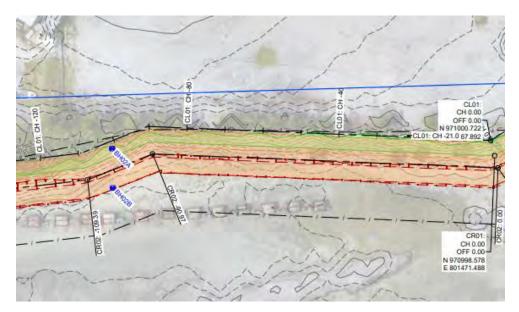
Typical Snapshot of Rock Revetment Alignment<sup>27</sup>
